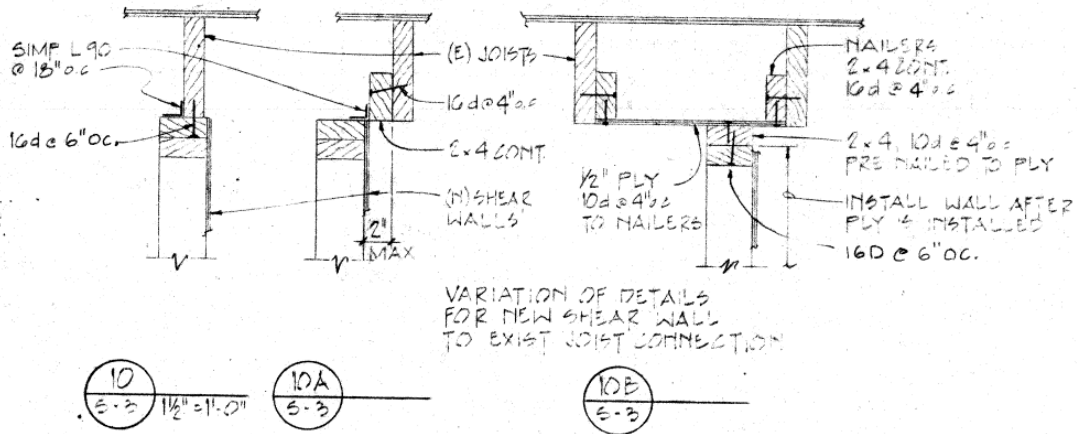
Top of Shear Wall Details (1993 Renovation)
